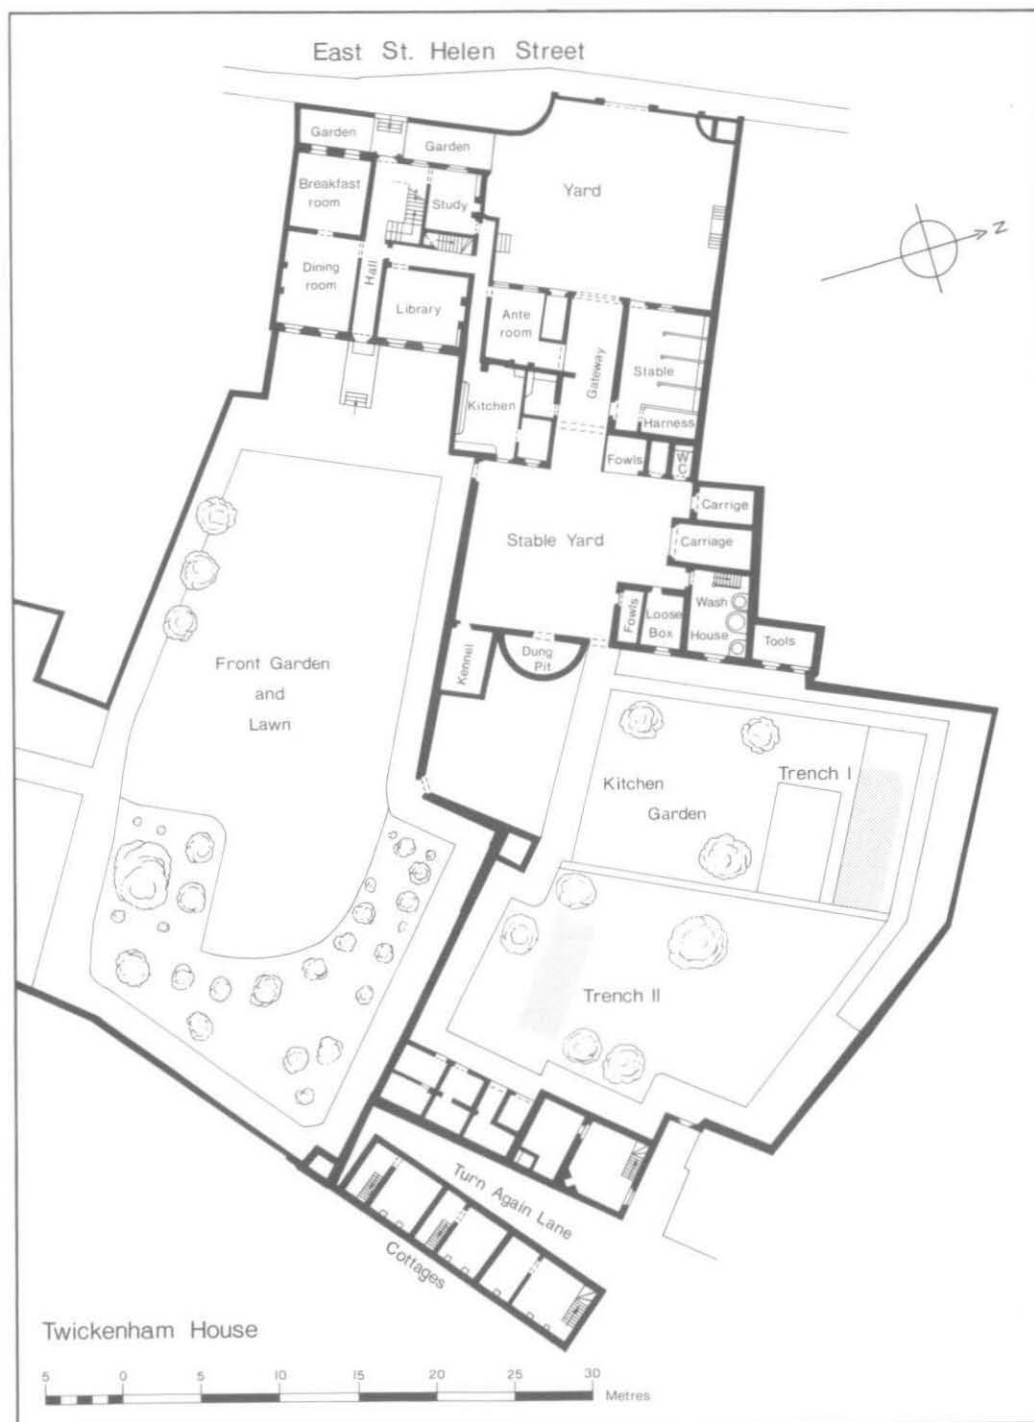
Plan of Twickenham House and the kitchen garden around 1875.
